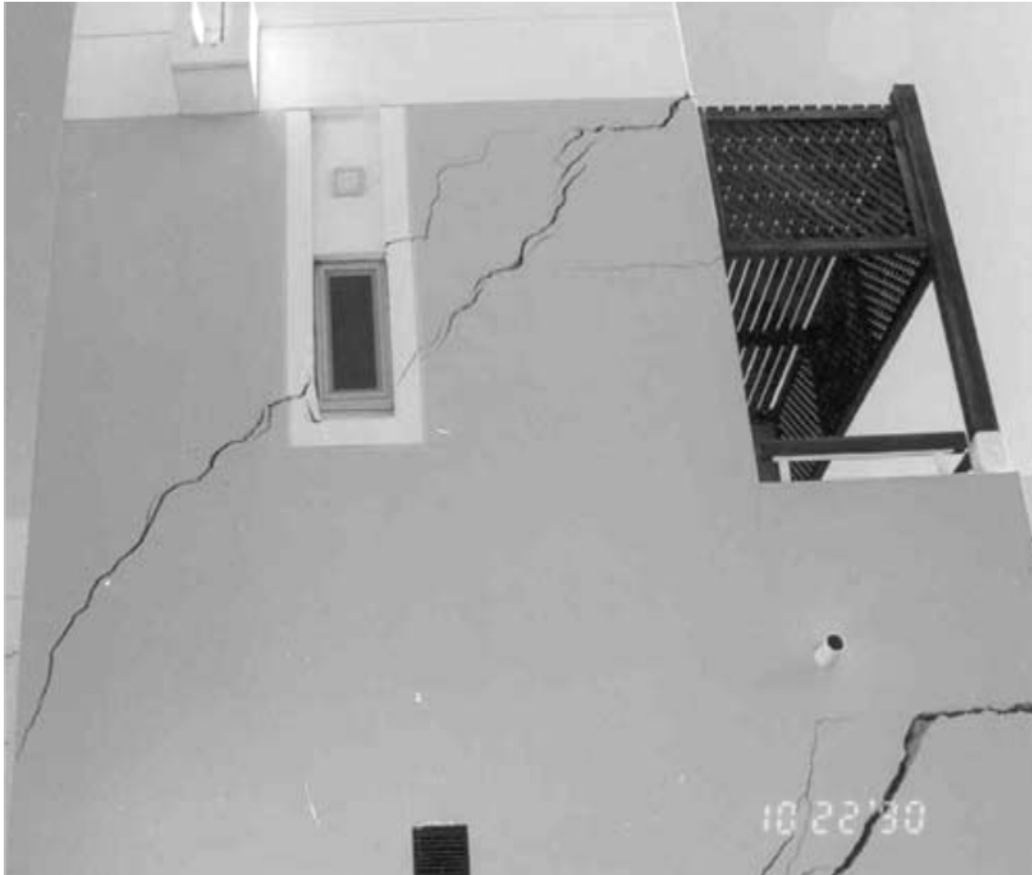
Building foundation failure (Al Rawas et al., 2005)
